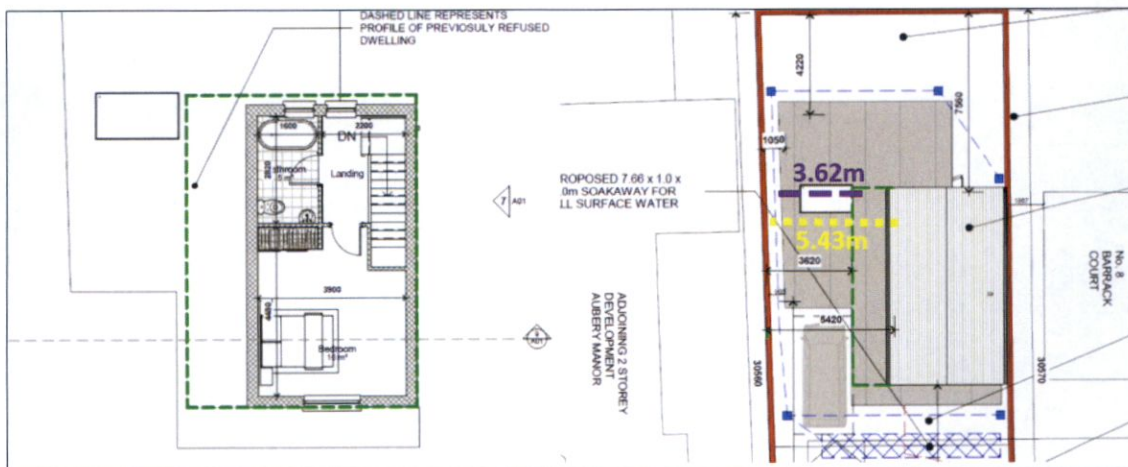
Currently proposed first floor plan (l) and proposed site layout plan (r). The black dashed line on the currently proposed first floor plan indicates the outline of the first floor plan as refused under Reg. Ref. SD19A/0128, whilst the purple and yellow dashed lines indicate the separation distance between the first floor level and the western site boundary both as per Reg. Ref. SD19A/0128 and as currently proposed.
